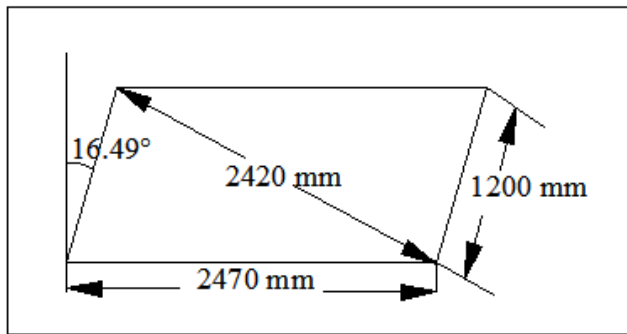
Dimensions of Experimental Test Specimen 1 [6]
